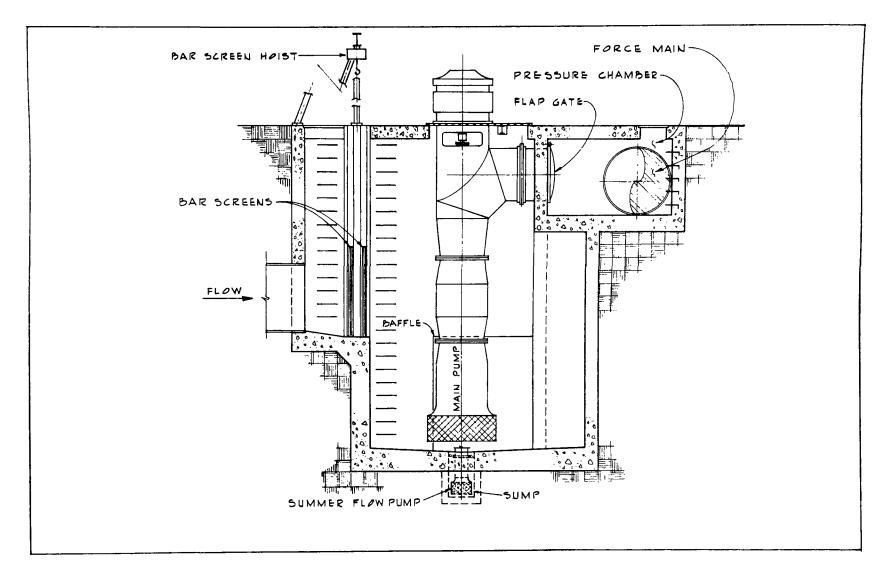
SECTION OF TYPICAL SUBSURFACE PUMP STATION
